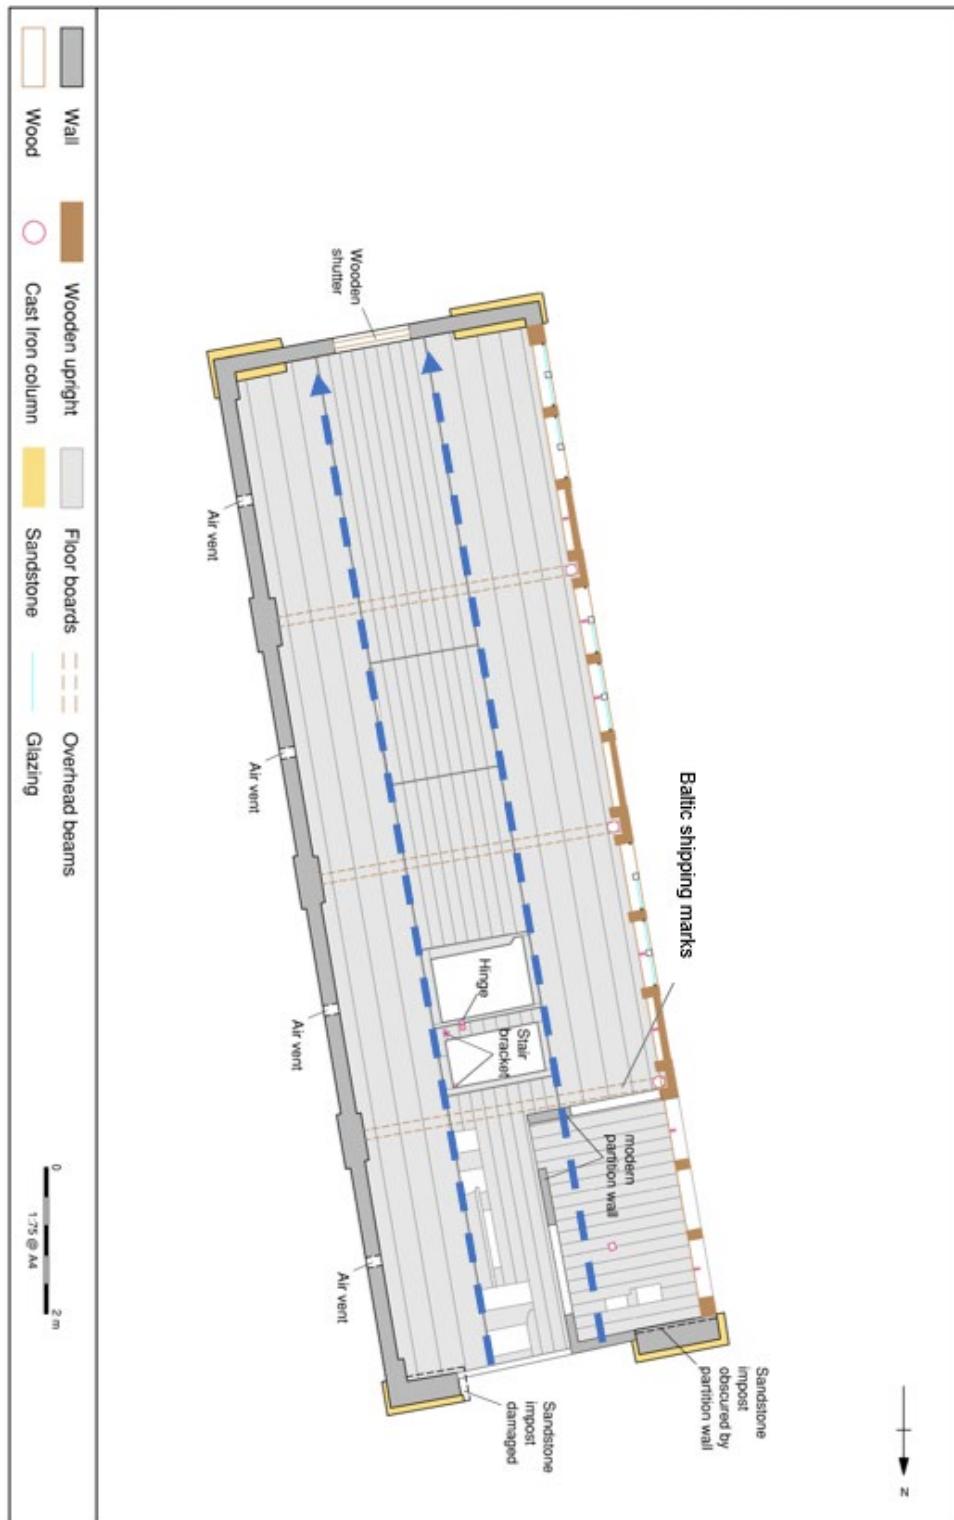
First-floor plan. The blue dashed arrows mark the direction of approach of fully laden waggons running along a track supported by waybeams below. The narrow timber planking between and trapdoors is later.
